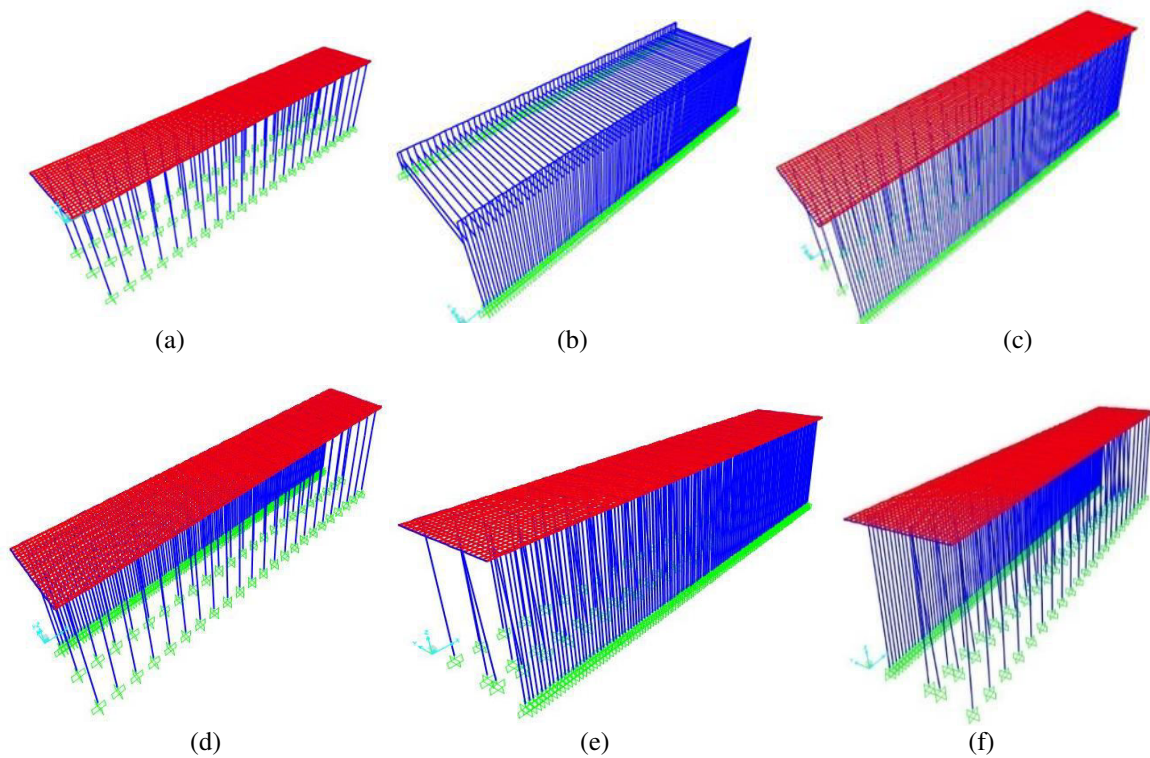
Model of the structures using SAP 2000 (a) Model 1- berthing structure supported on vertical piles (b) Model 2- berthing structure with diaphragm wall and tie rod (c) Model 3- berthing structure with front diaphragm wall supported on vertical piles (d) Model 4- berthing structure with front diaphragm wall supported on raker piles and vertical piles. (e) Model 5- berthing structure with rear diaphragm wall supported on vertical piles (f) Model 6- berthing structure with rear diaphragm wall supported on raker piles and vertical piles
